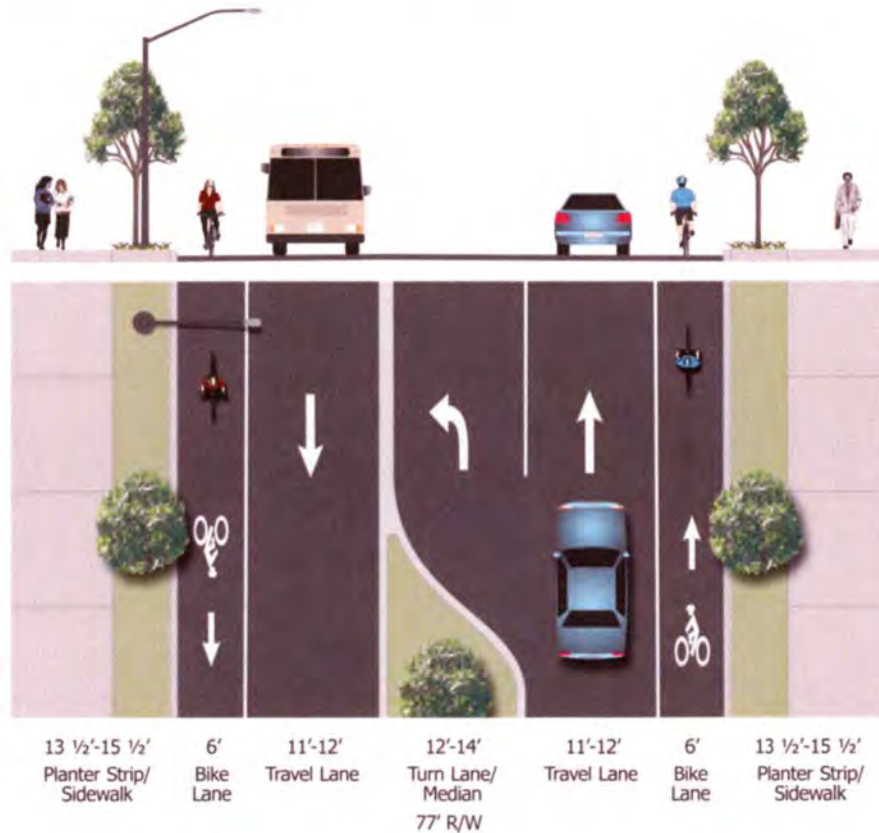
MAJOR ARTERIAL CROSS-SECTION
